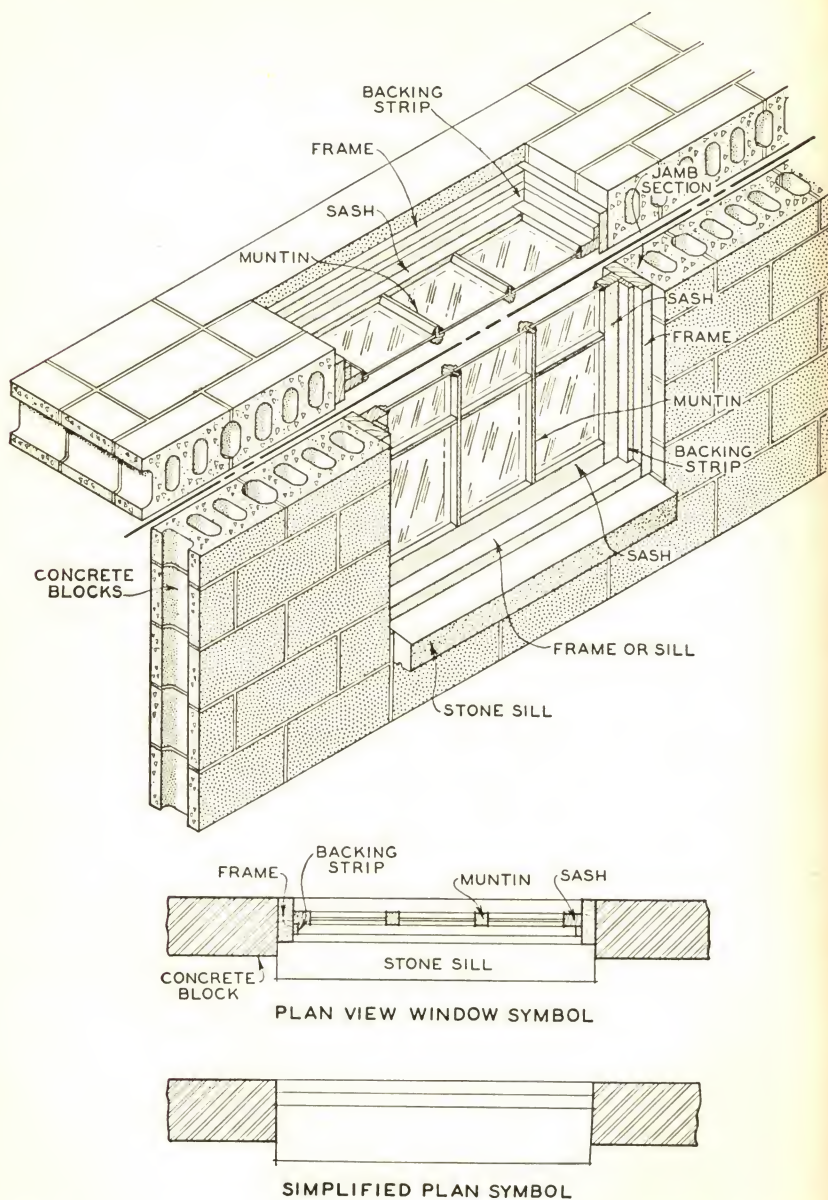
How to Visualize the Section View of a Window Jamb in a Concrete Block Wall
